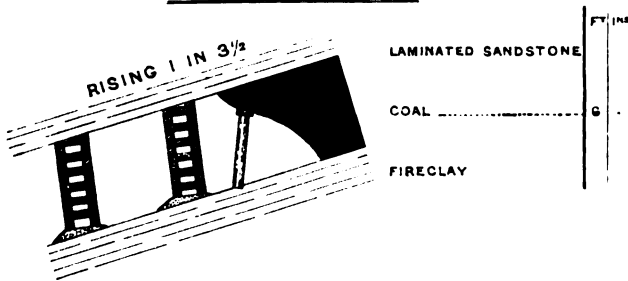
CLIFTON HALL COLLIERY, NEAR MANCHESTER. SECTION OF TRENCHERBONE COAL SEAM.
